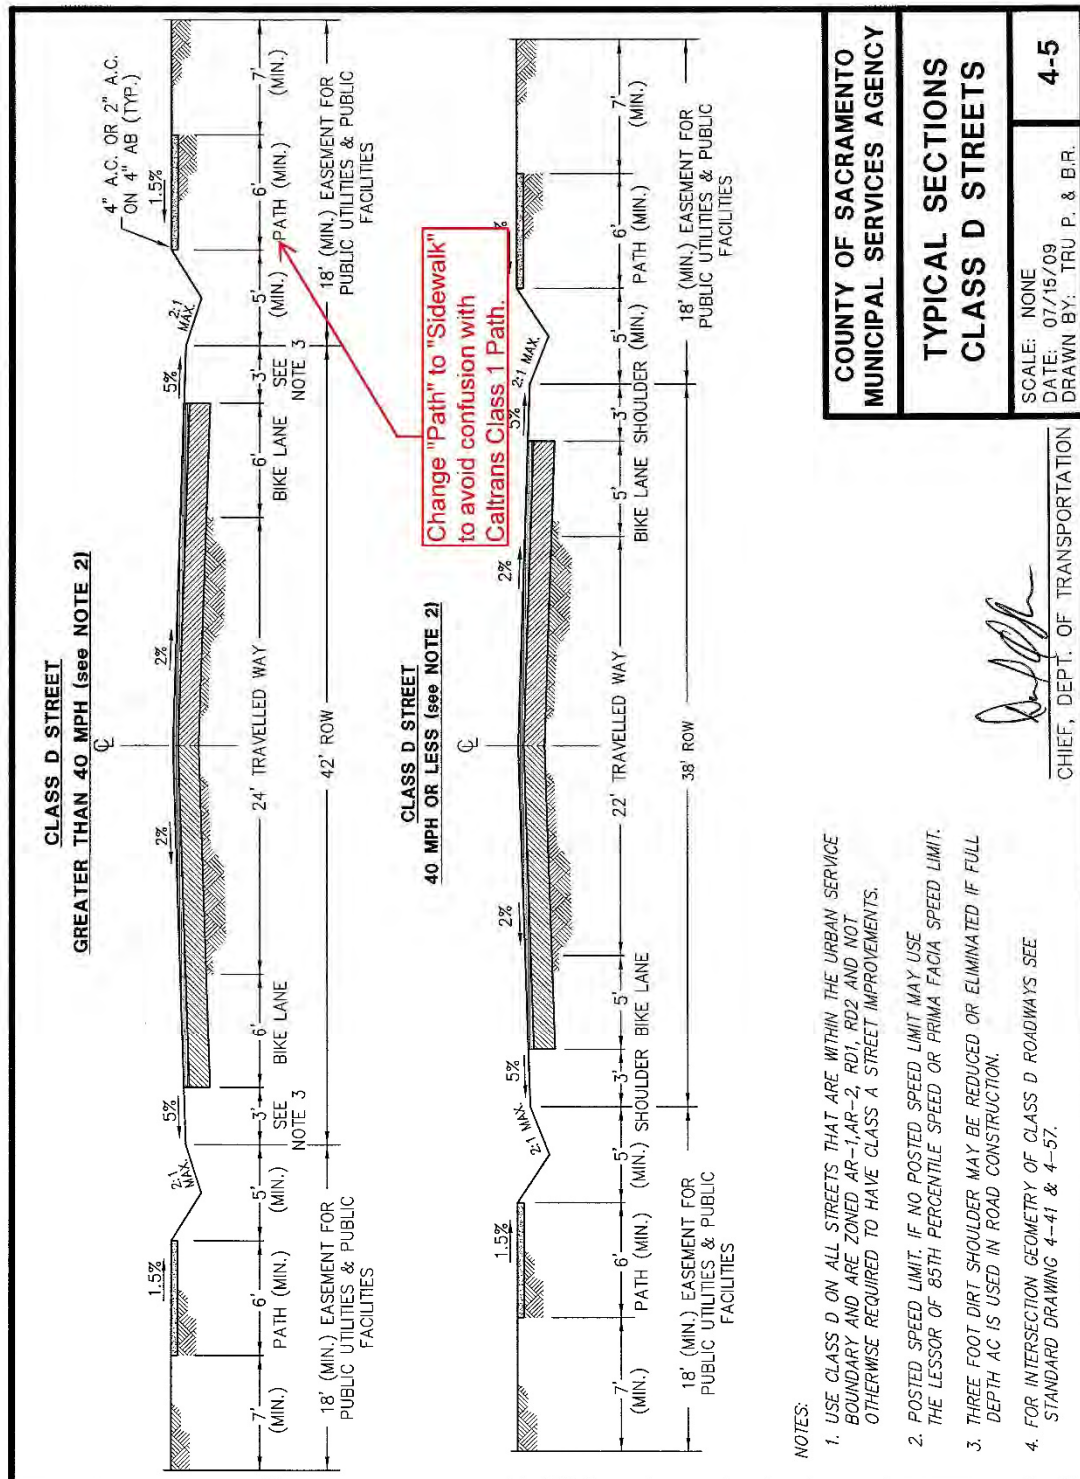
Standard Drawing Markup – Typical Sections Class D Streets
